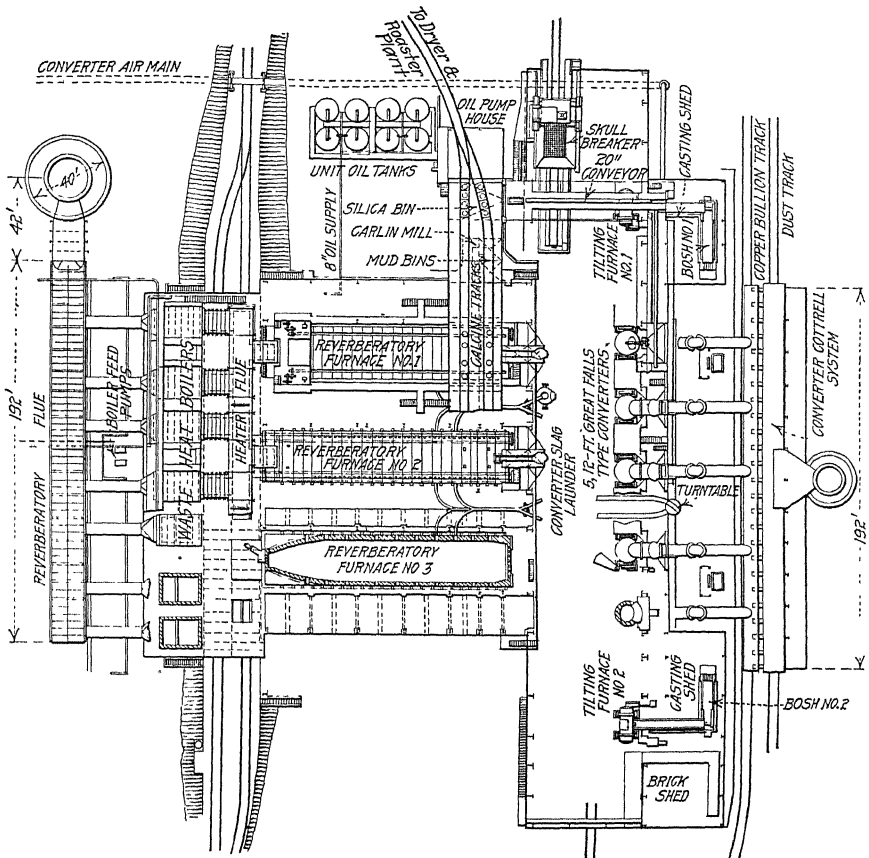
PLAN OF INTERNATIONAL SMELTING CO.'S PLANT.
